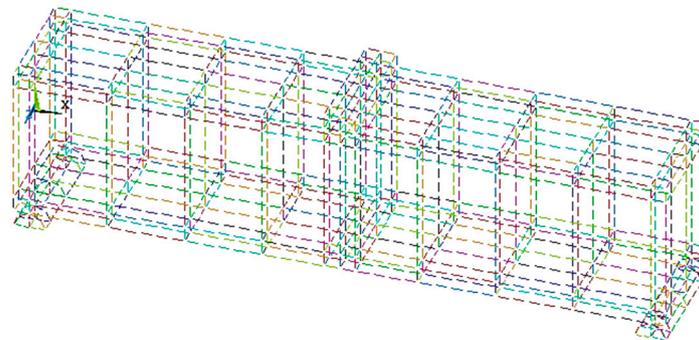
Typical idealization of the steel stirrups, top, and bottom bars.
